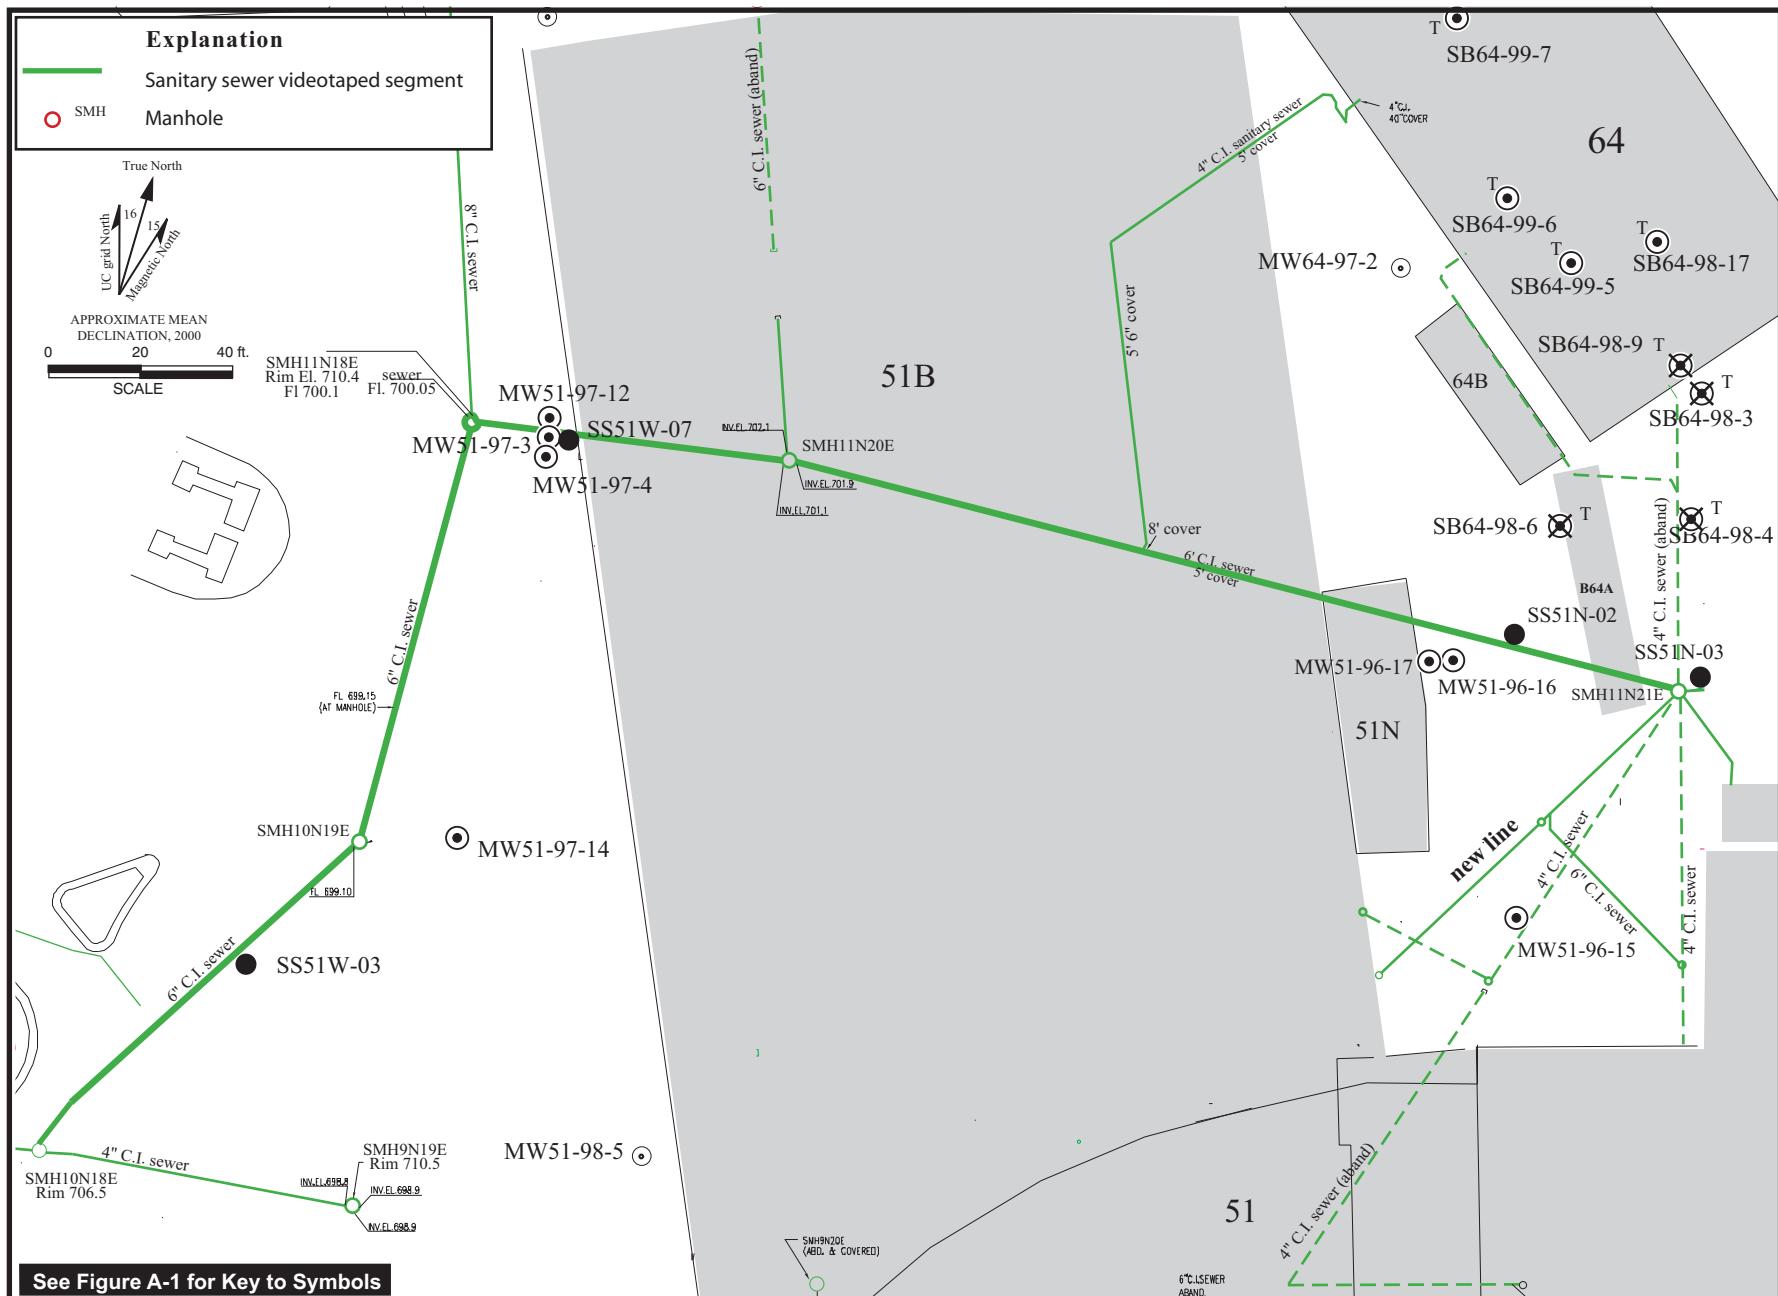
Locations of Videotaped Segments of Sanitary Sewers North and West of Buildings 51 and 51B (AOC 9-8).
